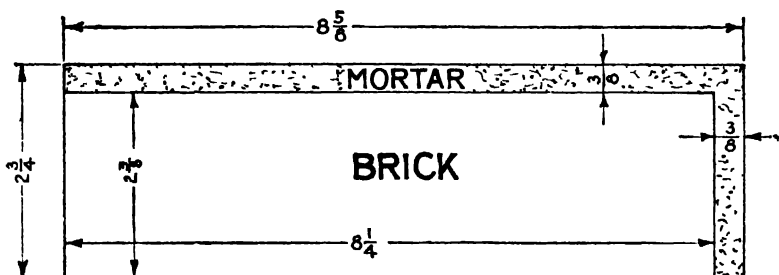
,635 —Brick and mortar joint illustrating the surface area method of calculation.
